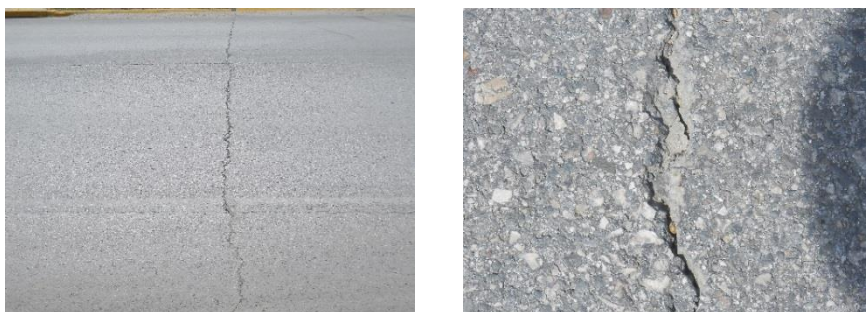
High Severity Reflection Joint Cracks from Iowa Test Sections.
